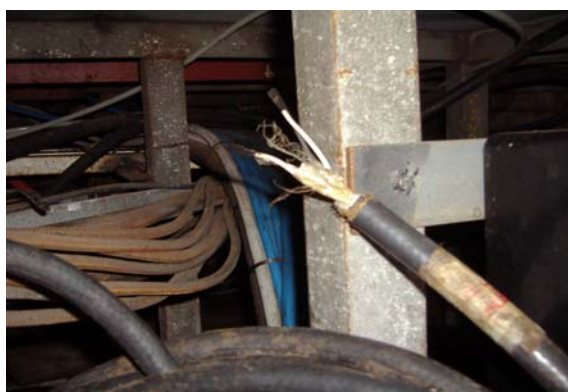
Damaged Conduit and Exposed Wiring
